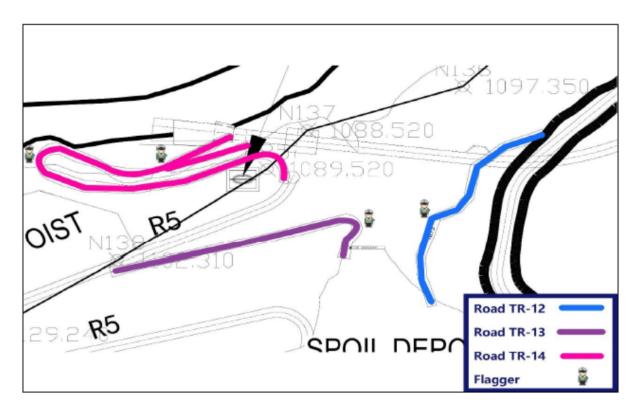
Layout of Access Roads to Tailrace Tunnel and Power House
